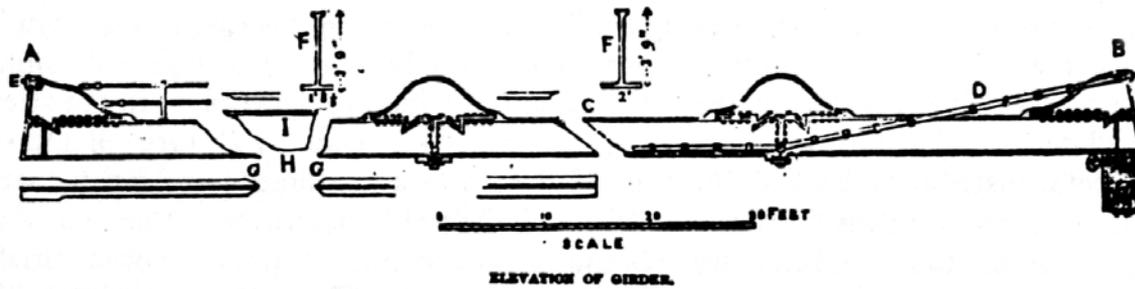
Elevation of trussed cast-iron girder of Dee Bridge showing where the beam failed. The wrought iron trussing is intended to act in suspension and the ill-conceived longitudinal-section is of reduced depth at center span. Robert Stephenson and Bidder. (Sutherland²)
